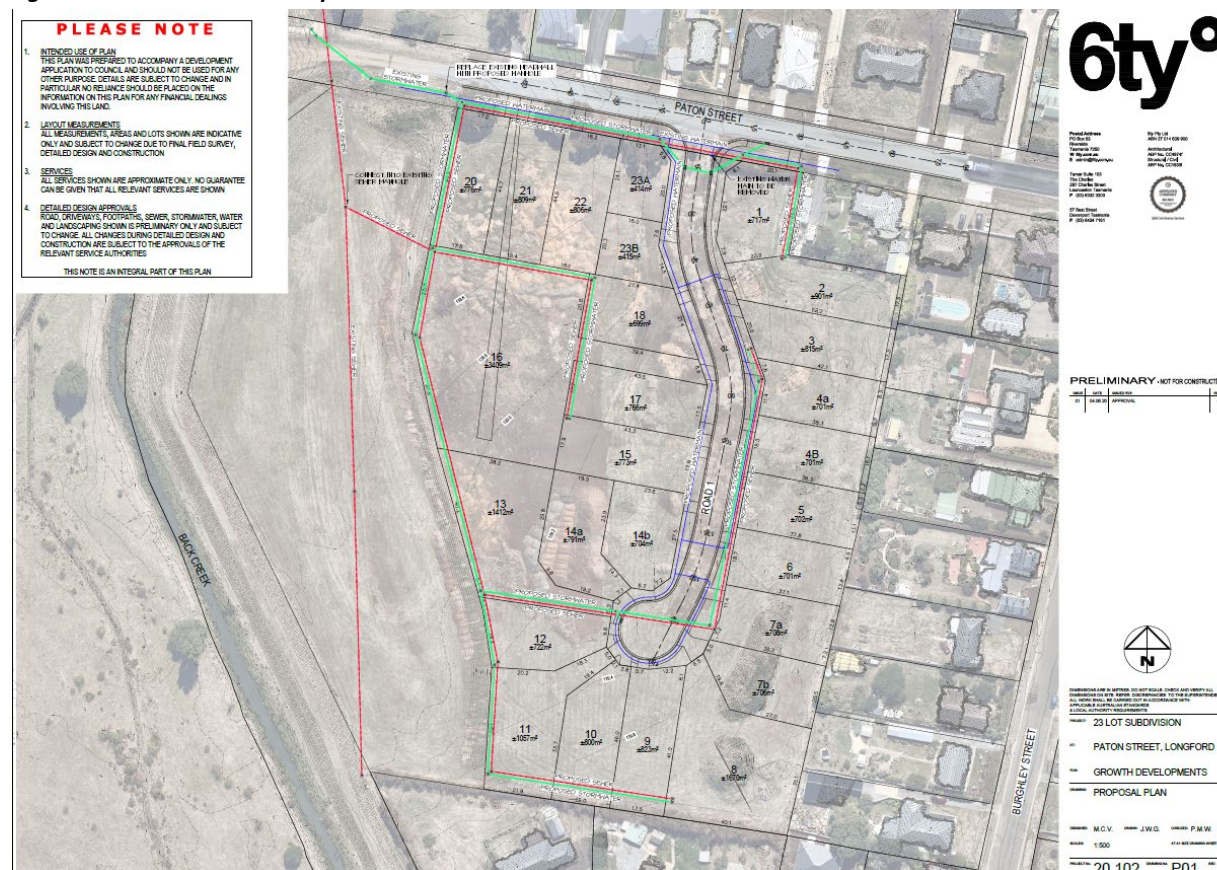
PLN-20-0156 - Proposed Subdivision Plan
